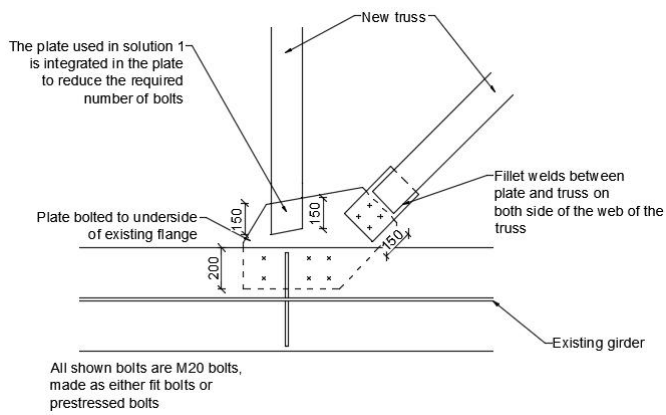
The second solution for the connection between the K-shaped truss system and the bottom flange of the existing girder
